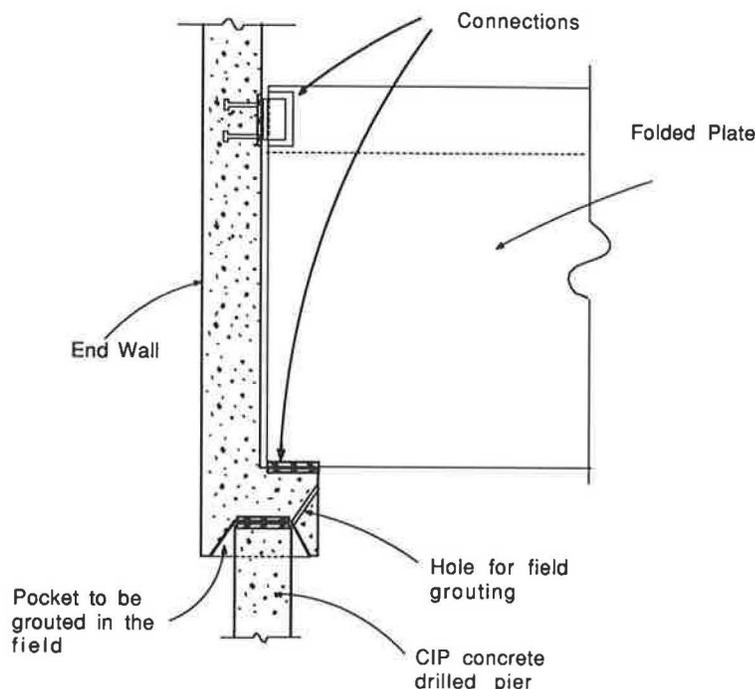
Folded-plate to end wall connection, Section B-B.
